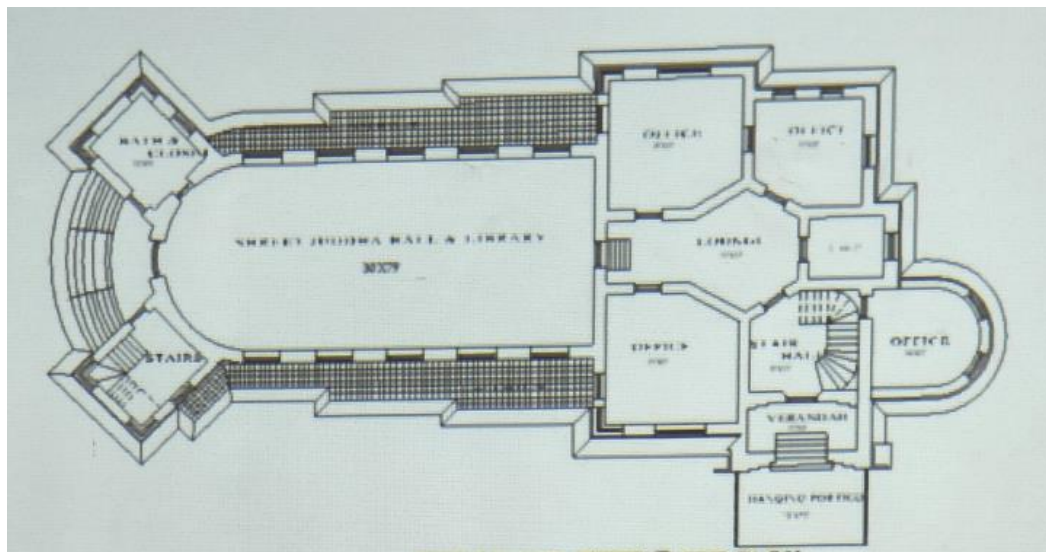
Saraswati Sadan Juddha Library Trichandra College Plan and Elevation
